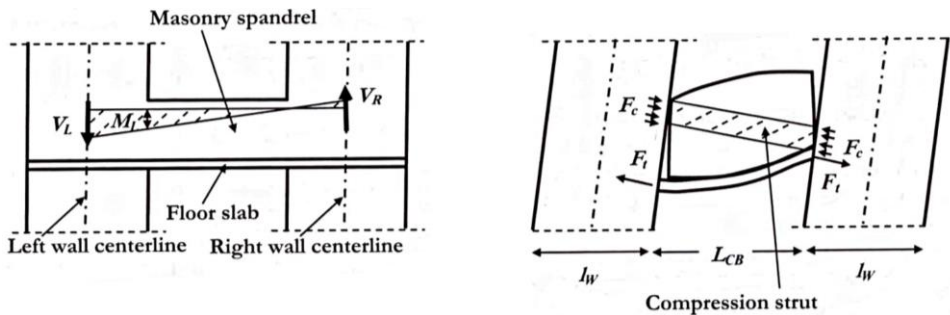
Masonry spandrel supported by a concrete slab [38]
